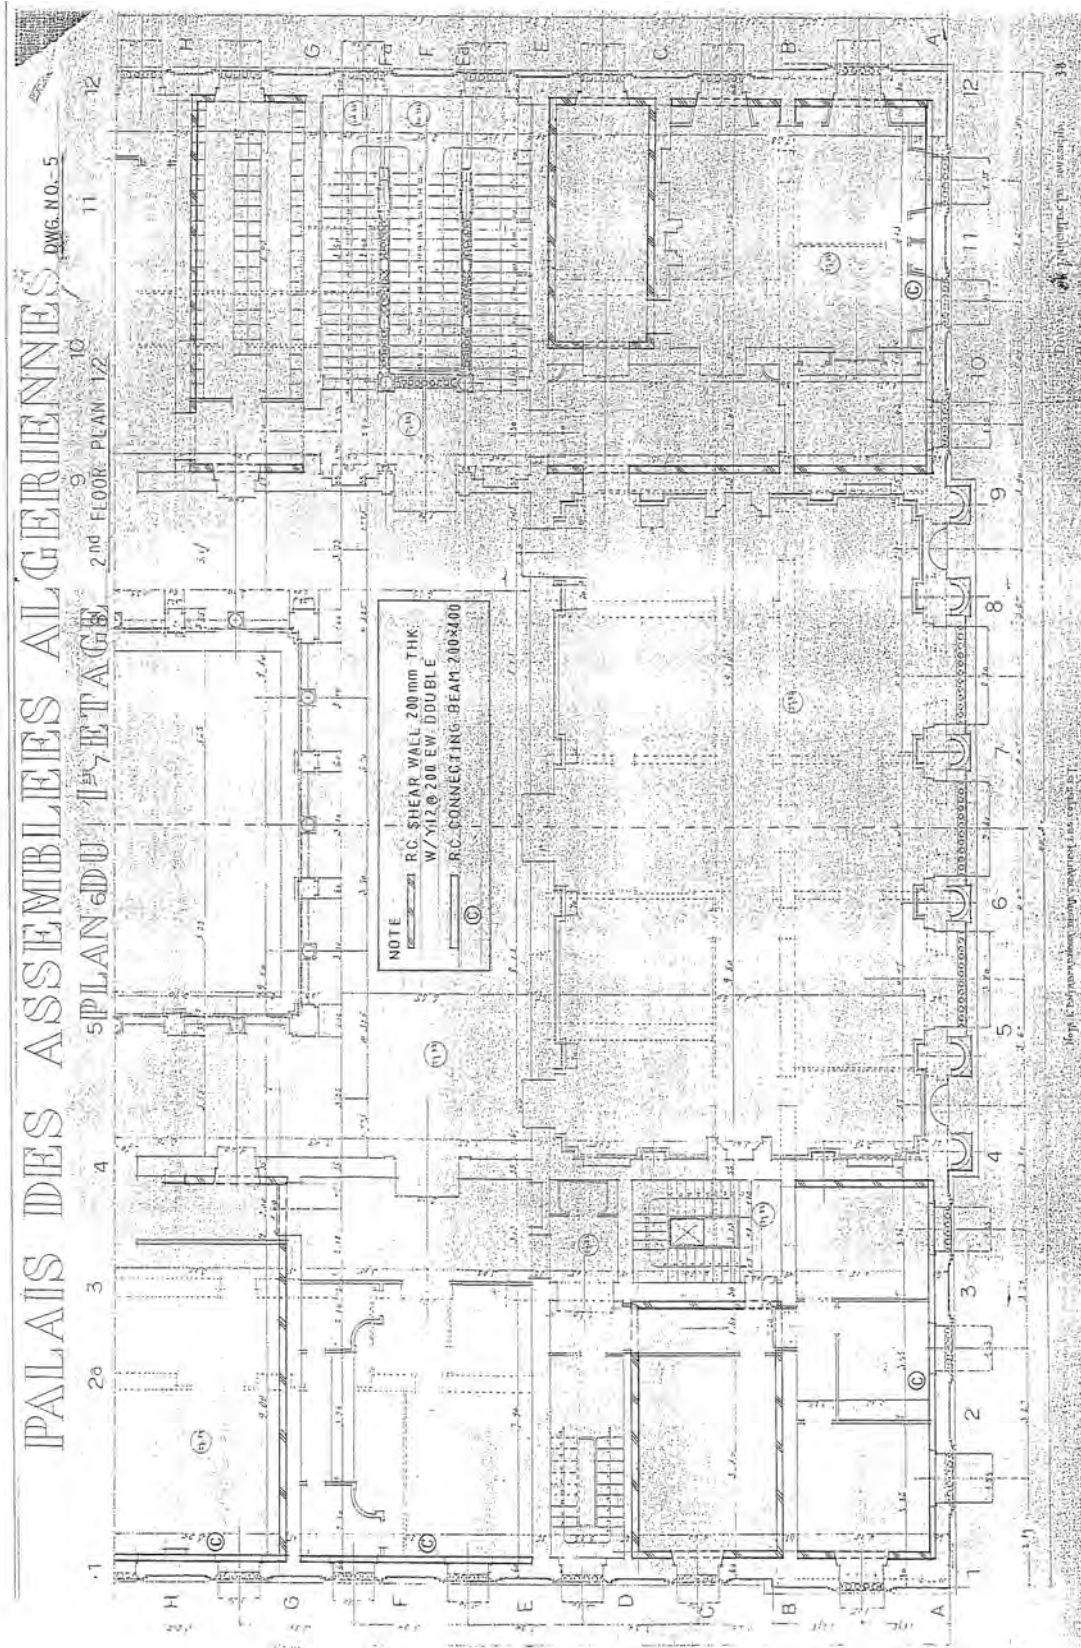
Retrofit Plan on 2nd Floor (1/2)
